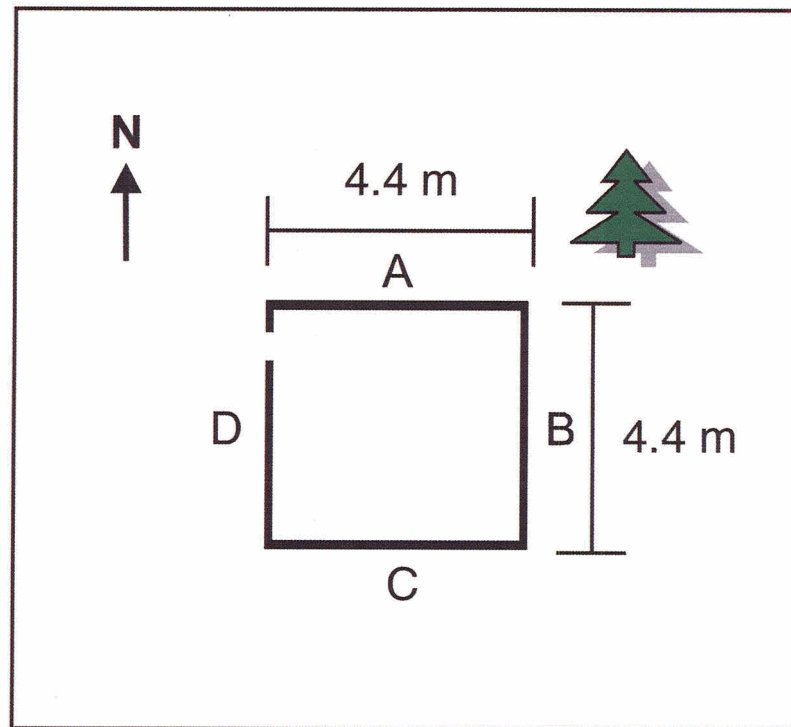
Tangle Creek Cabin dimensional drawing.
